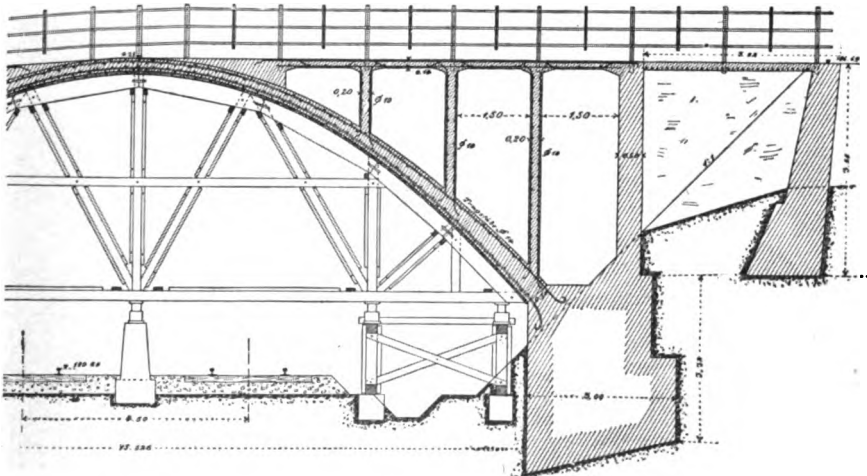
Foot bridge over the Metz-Vigy Line. Longitudinal section.
